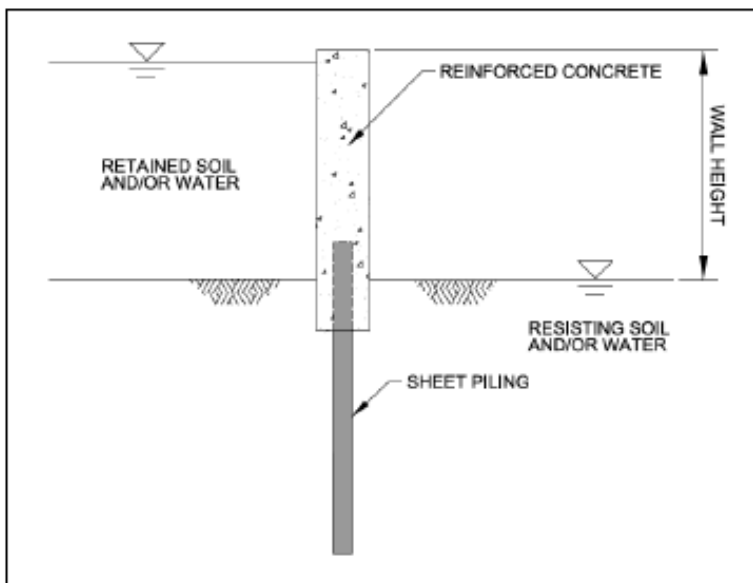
Example Sheet Pile Wall with Concrete Cap
